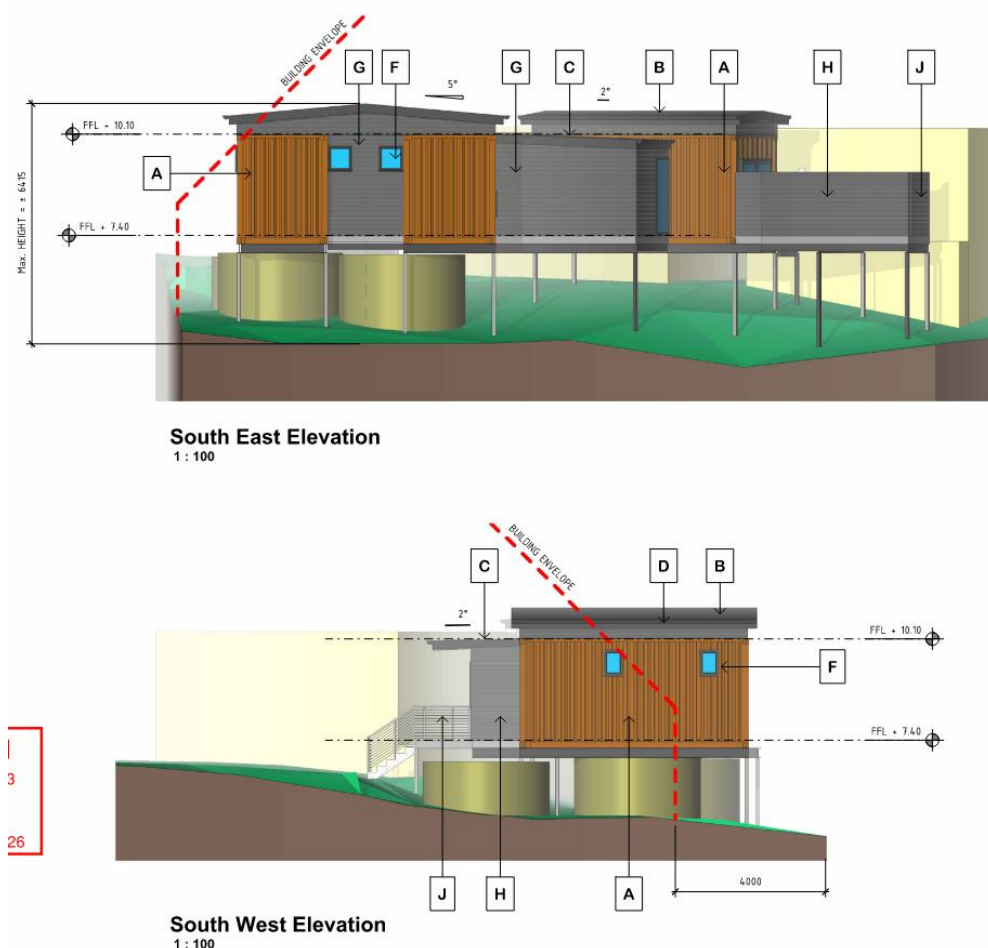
Proposed elevations - South East and South West (source: Stuart Bowling Building Design)
